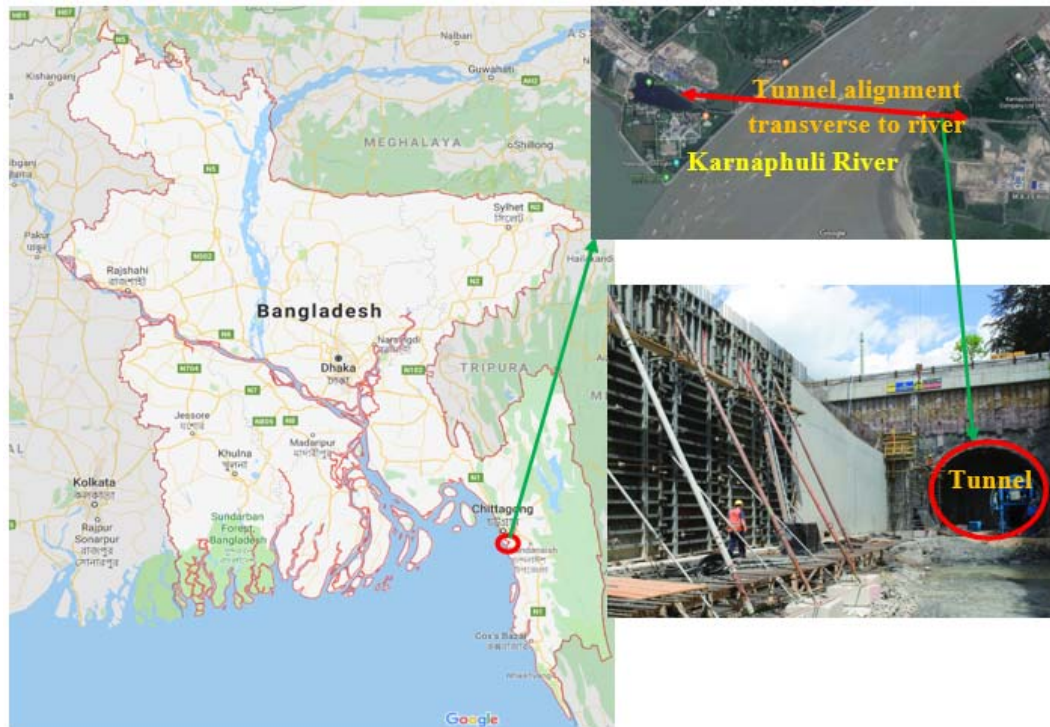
Under construction of tunnel at Potenga, Chittagong, Bangladesh
